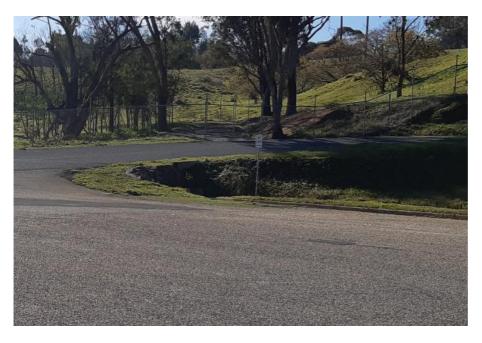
Retaining wall (overgrown), culvert and drainage in Hume Dam Works Compound, near Nissan Hut 2 (Jacobs, 2020).
